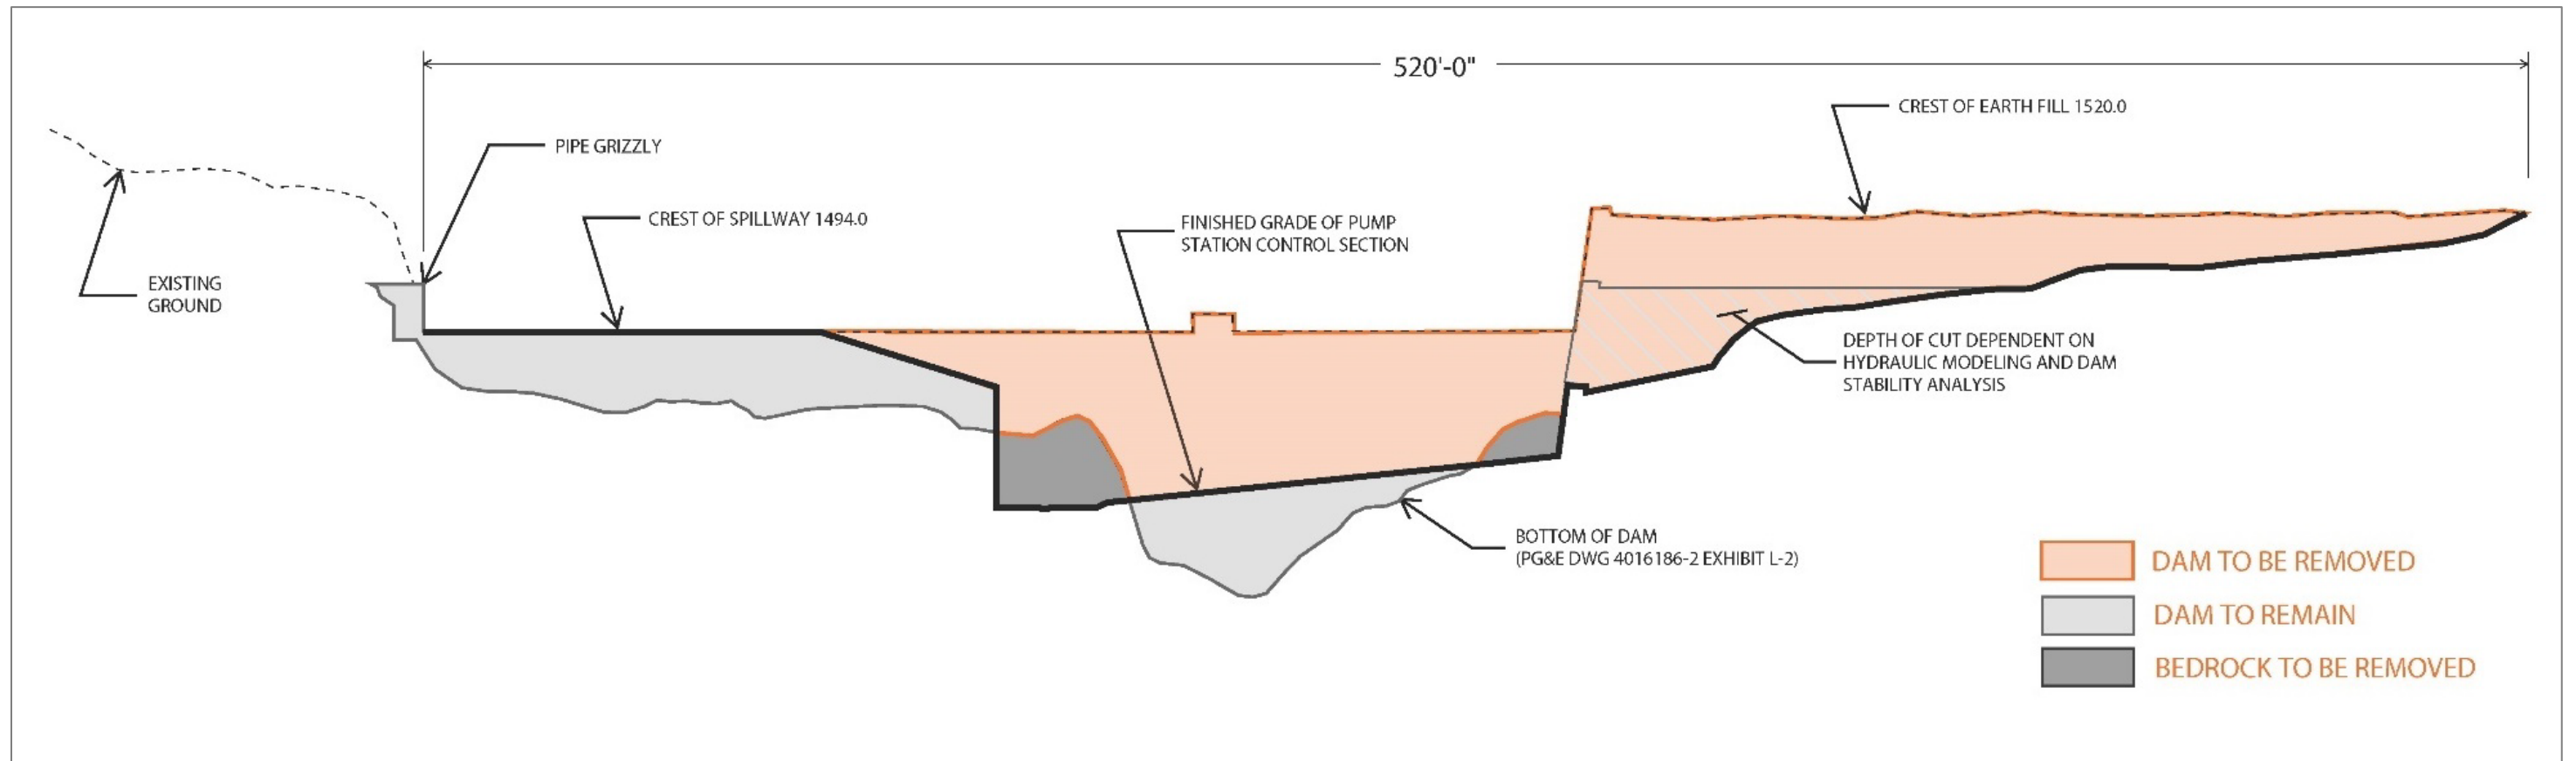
Cape Horn Dam removal plan—final dam removal (cross section through dam).
